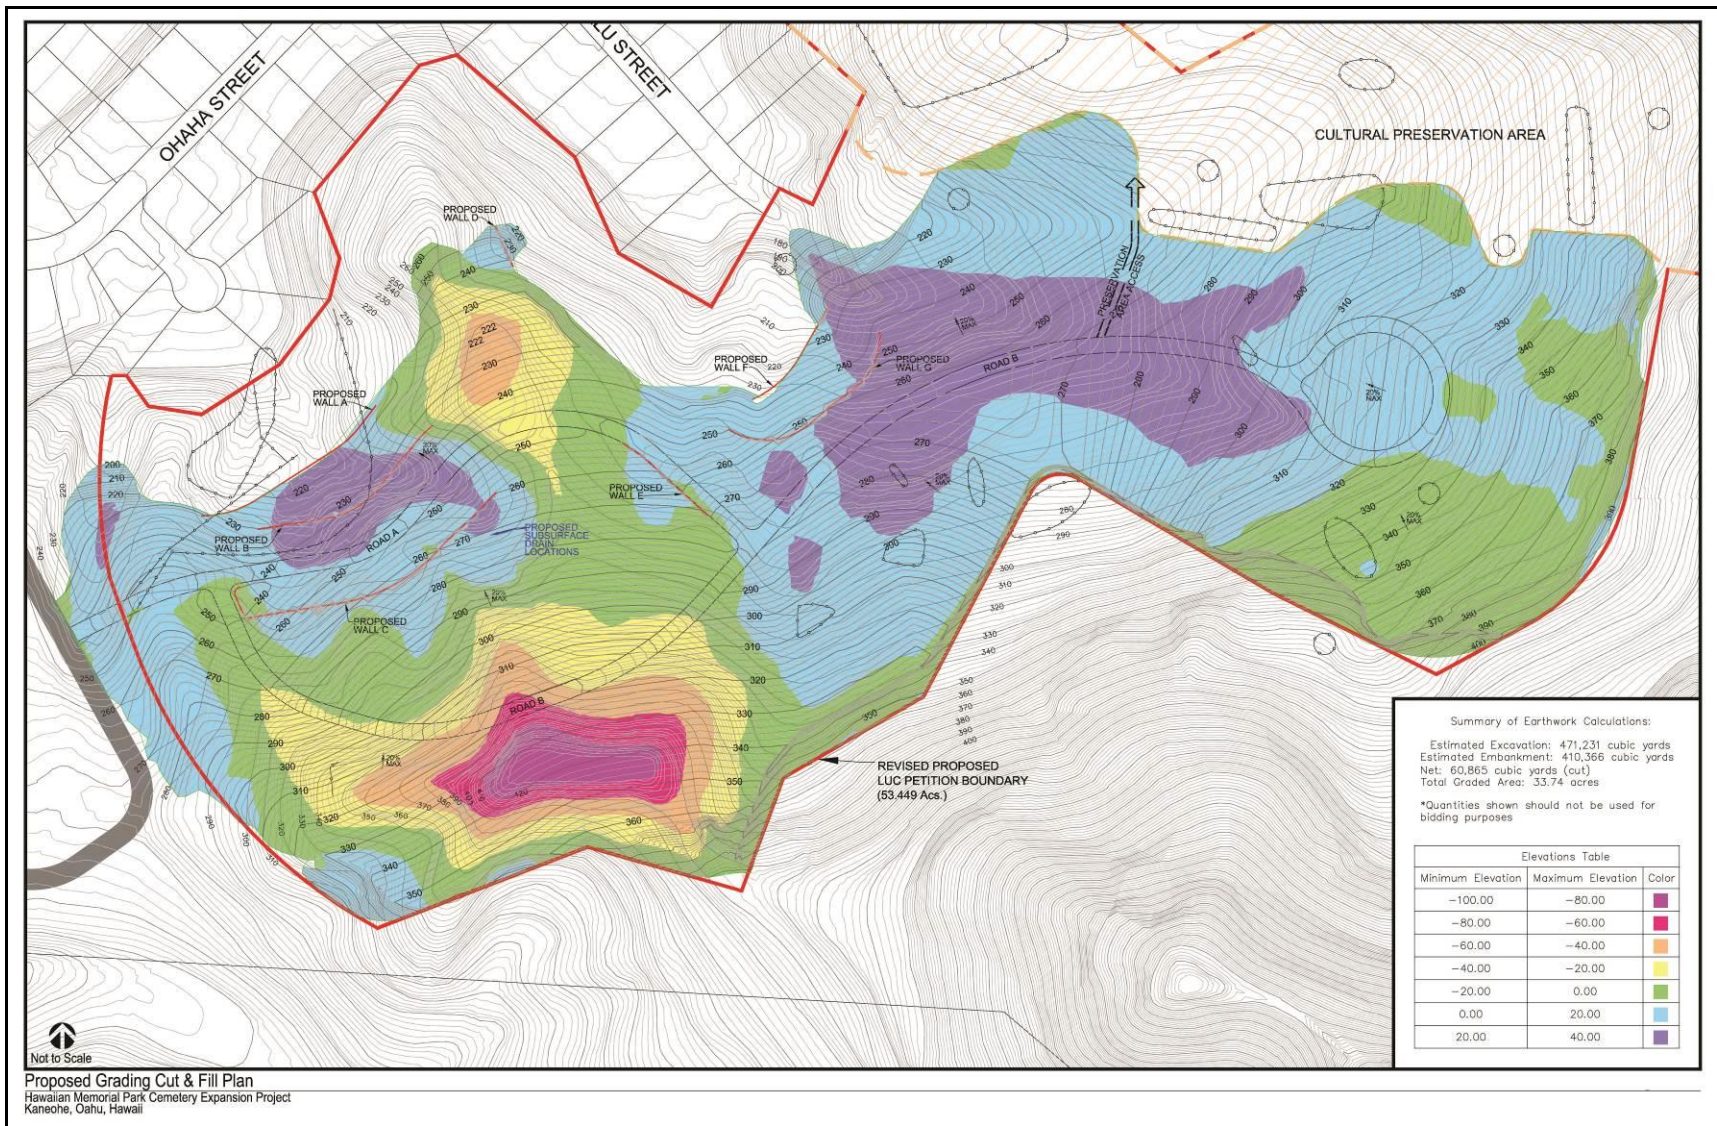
2018 Proposed Grading Plan with color-coded elevations of earthwork (HHF Planners 2018)
